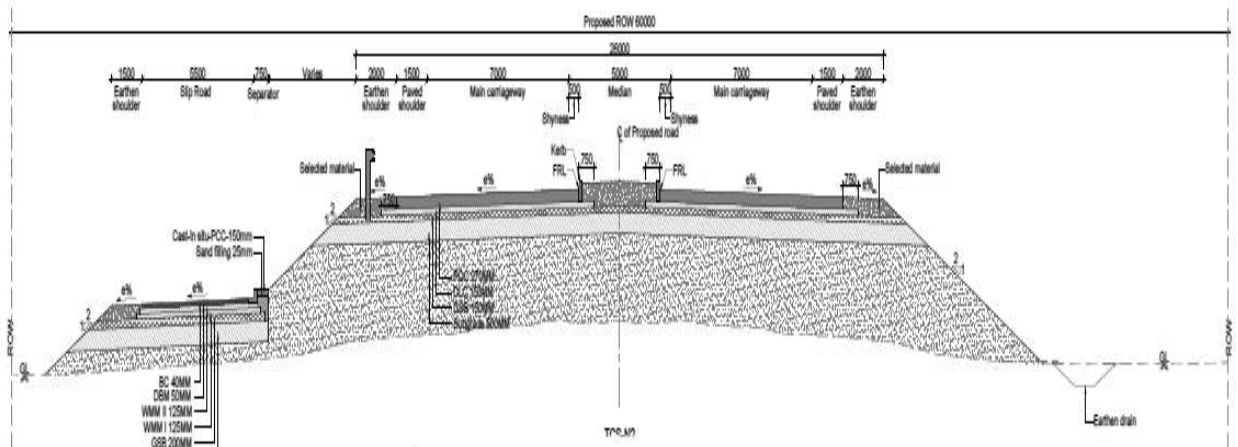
TCS-N2 Typical Four Lane Underpass Cross Section with Slip Roads in Bypass & Realignment
